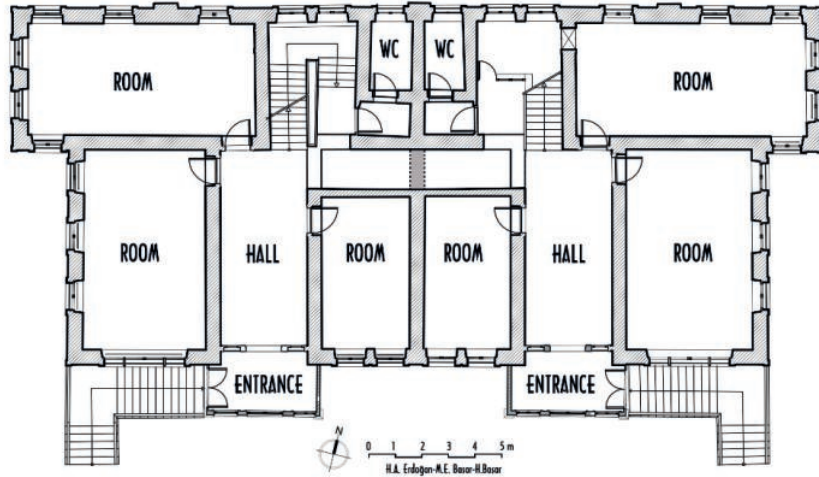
First Floor Plan of Girls' Secondary School (Hacı Abdullah Erdoğan, Mehmet Emin Başar, Hüseyin Başar Archive)
